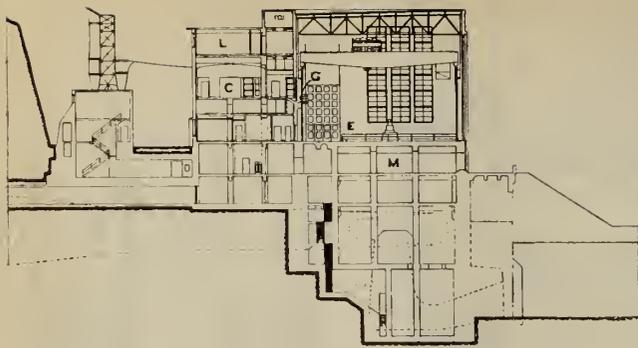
Typical cross section of the powerhouse through central erection bay and control section.
